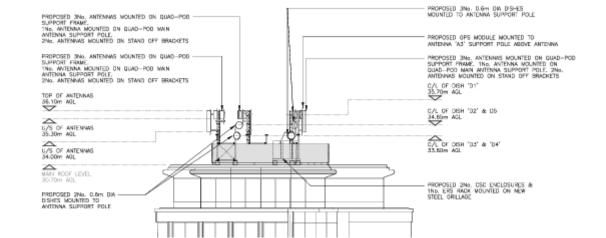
Proposed North East Elevation previous design failed under LPA ref: 2020/1649/P
